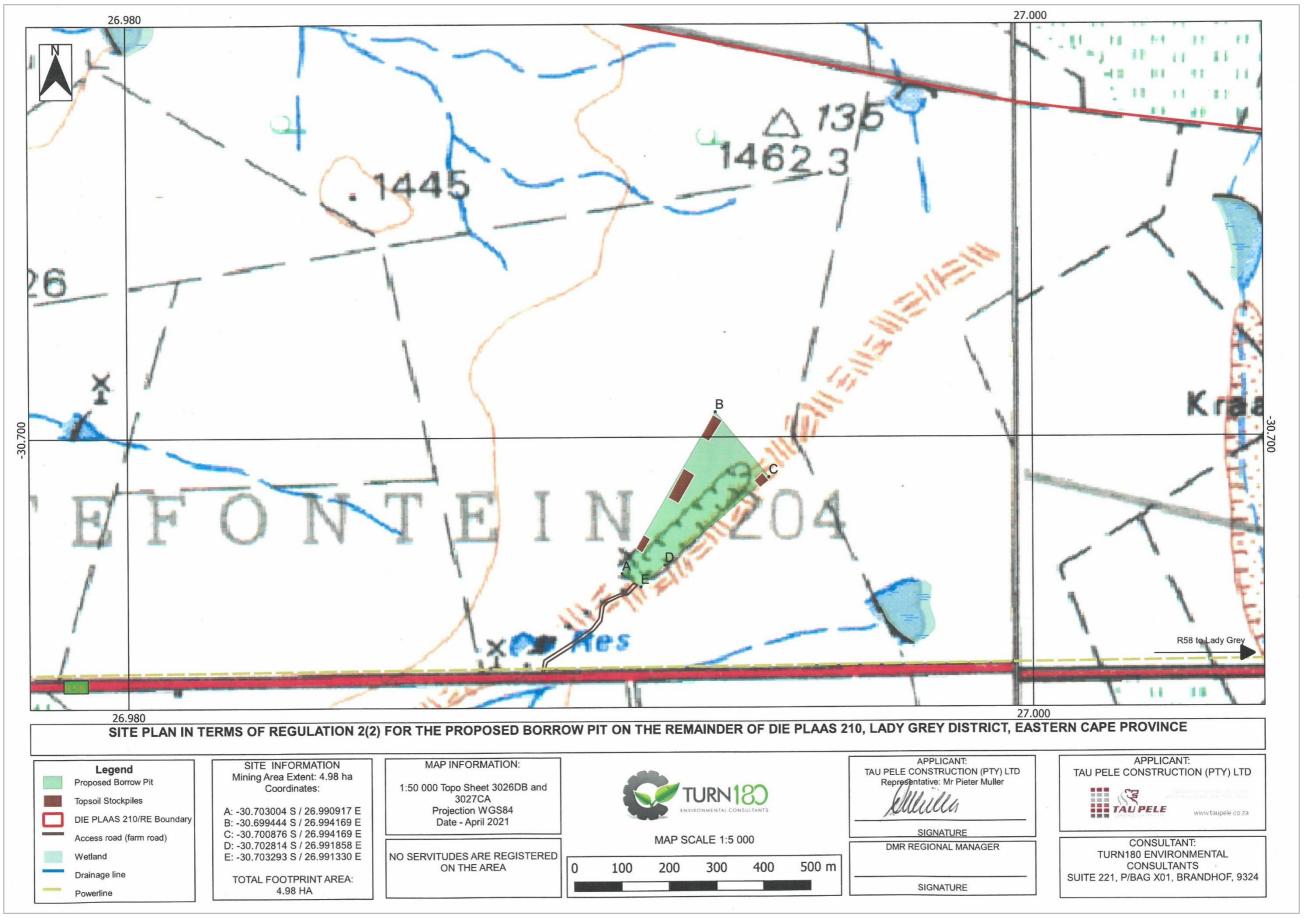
Site Plan and associated activities of the Proposed Borrow Pit (indicated in green).
